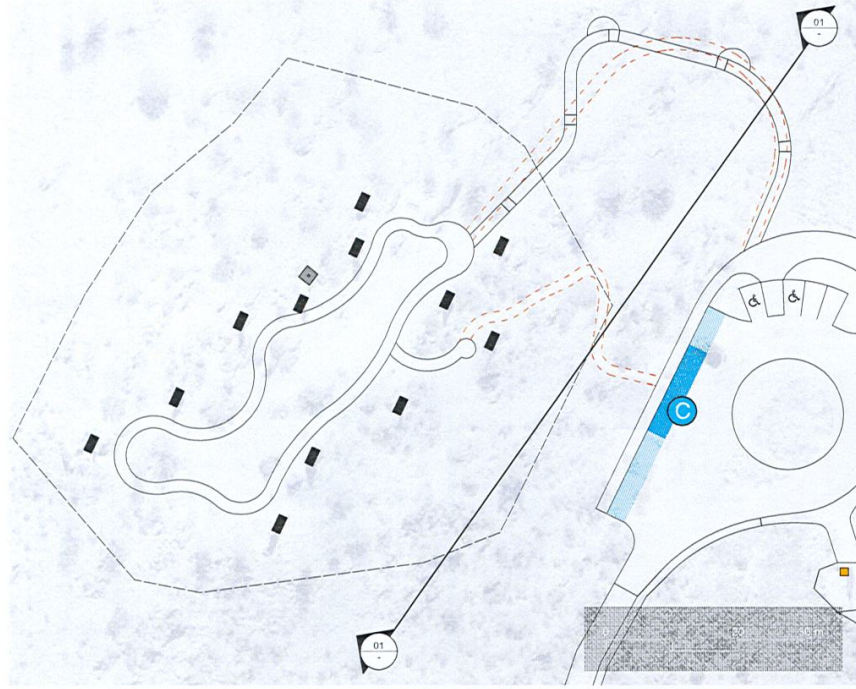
The Sculpture Hill - Alternative accessible link boardwalk platform concept - Plan
